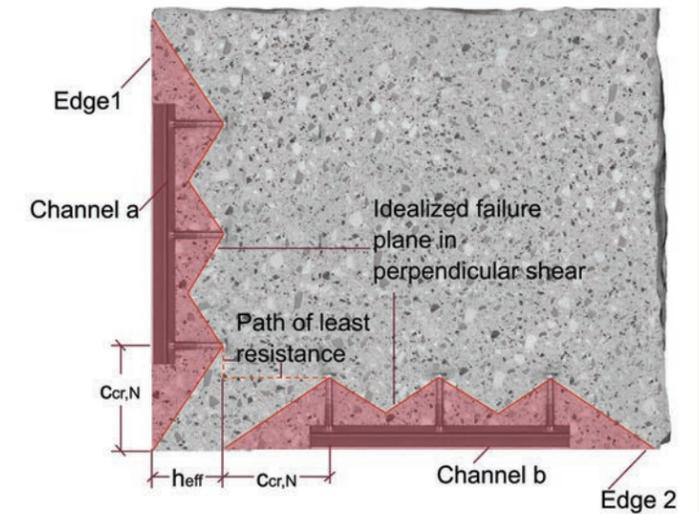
90° corner with anchor channels on both sides — Failure planes does not intersect.
